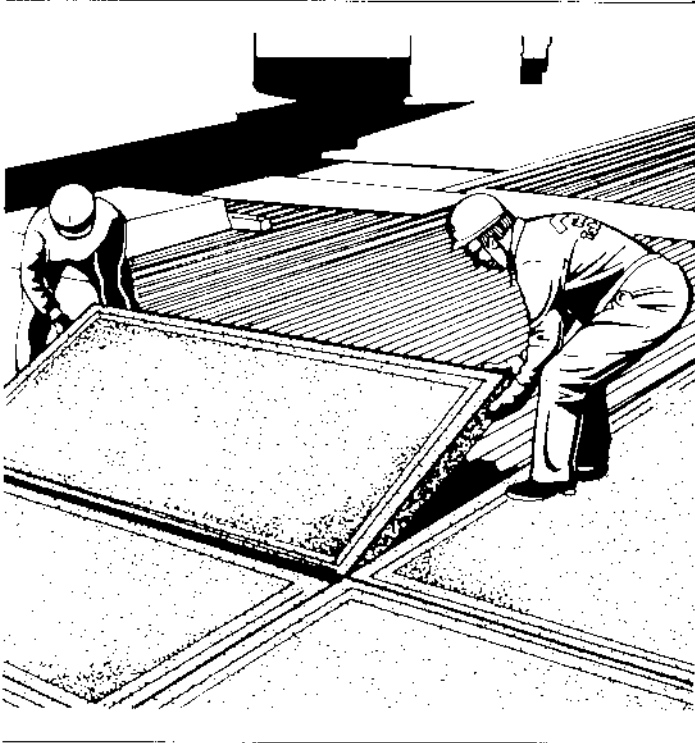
The prefabricated roofing elements are layed onto the steel deck
